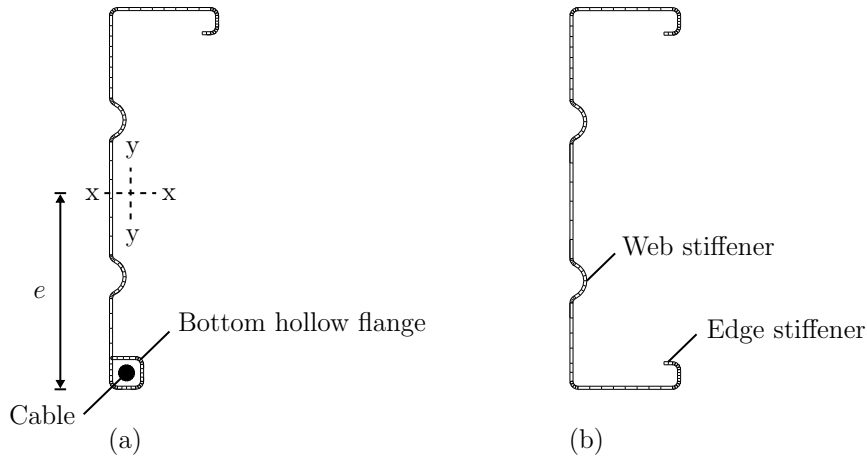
(a) Cross-section profile of the proposed prestressed cold-formed steel beams. (b) Lipped channel cross-section with web and edge stiffeners tested by Kyvelou *et al.* (2017).
